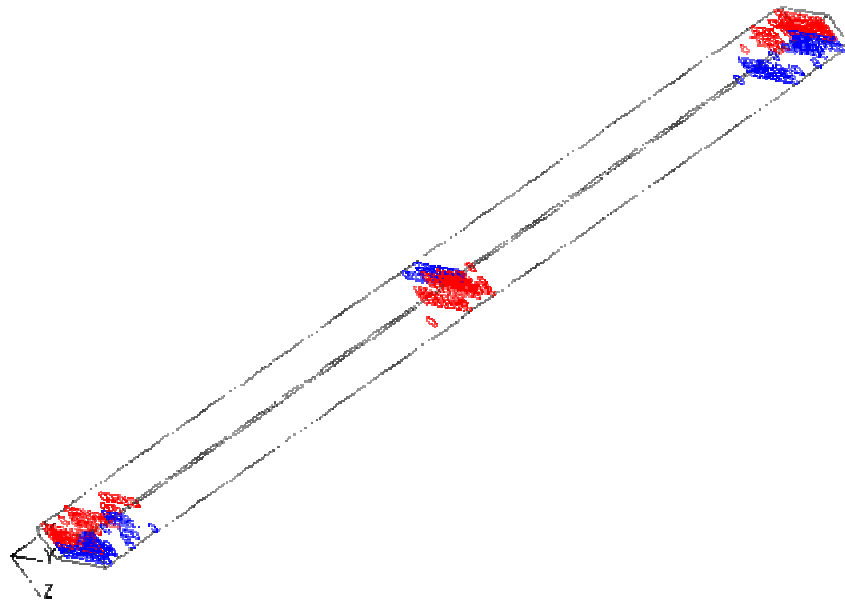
Slab Strip 6 Element Mesh; First Cracking At Fixed Ends
